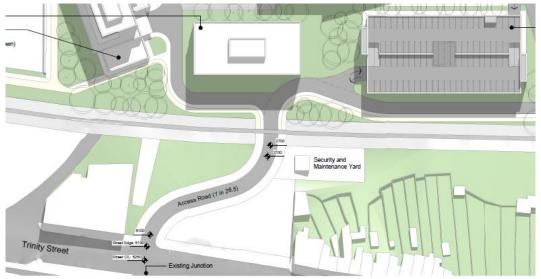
Sinuous Access Road Alignment (Note: the site layout in this plate is taken from the conceptual design stage and contains elements have been updated as part of the final design)
